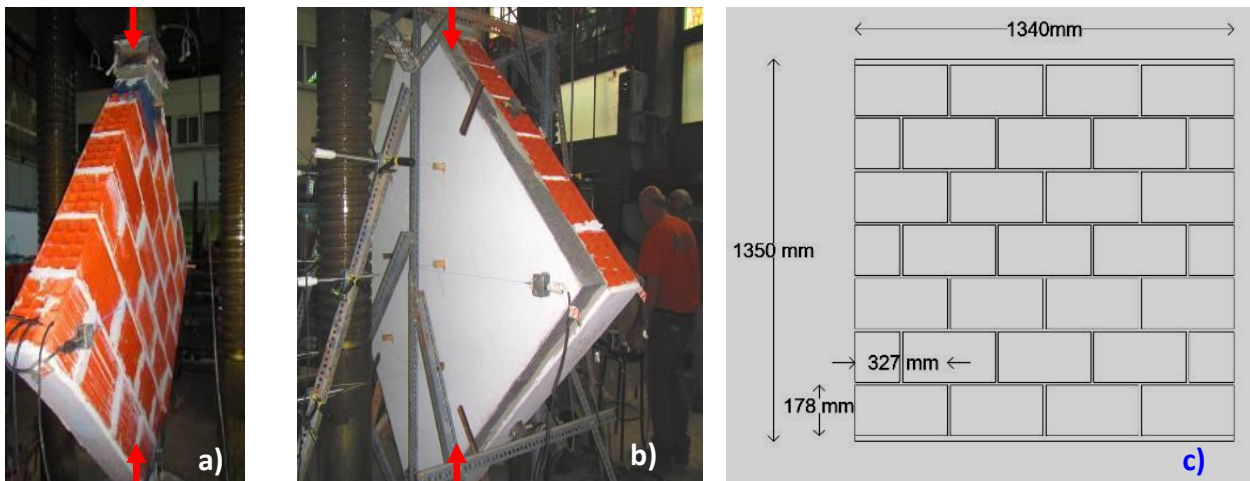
Diagonal in-plane compression of unreinforced brick masonry wallets. a) without b) with thermo-insulating façade. c) Typical dimensions of the specimens (nominal thickness 150mm)
